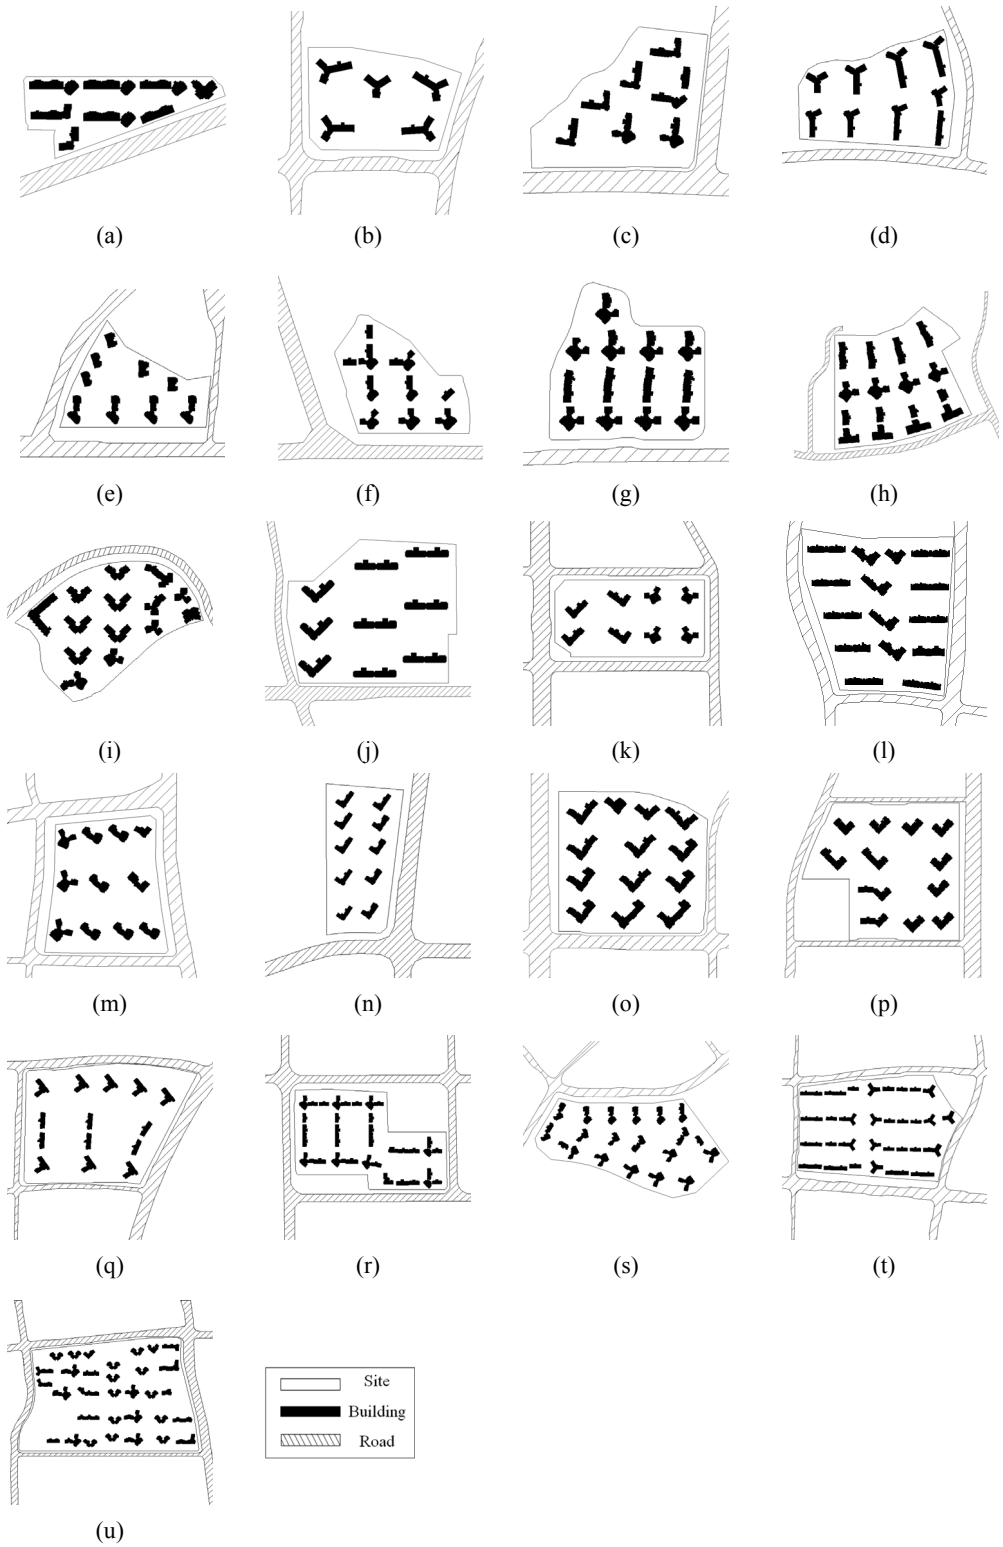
Schematic site plans of 21 apartment complexes(no-scale)
